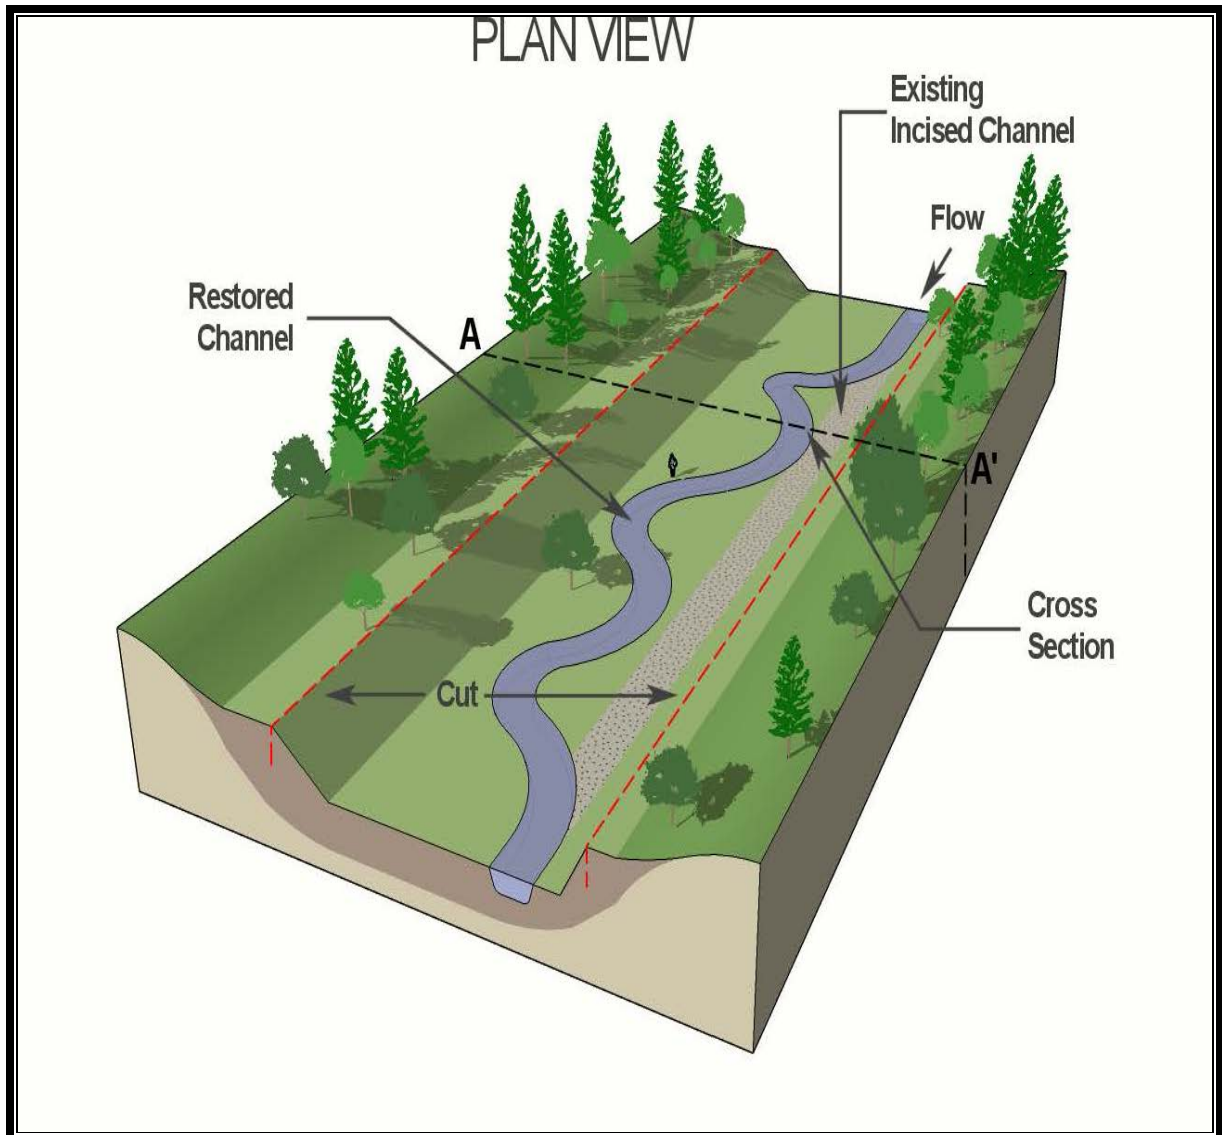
P2-FLOODPLAIN EXCAVATION APPROACH-PLAN VIEW
